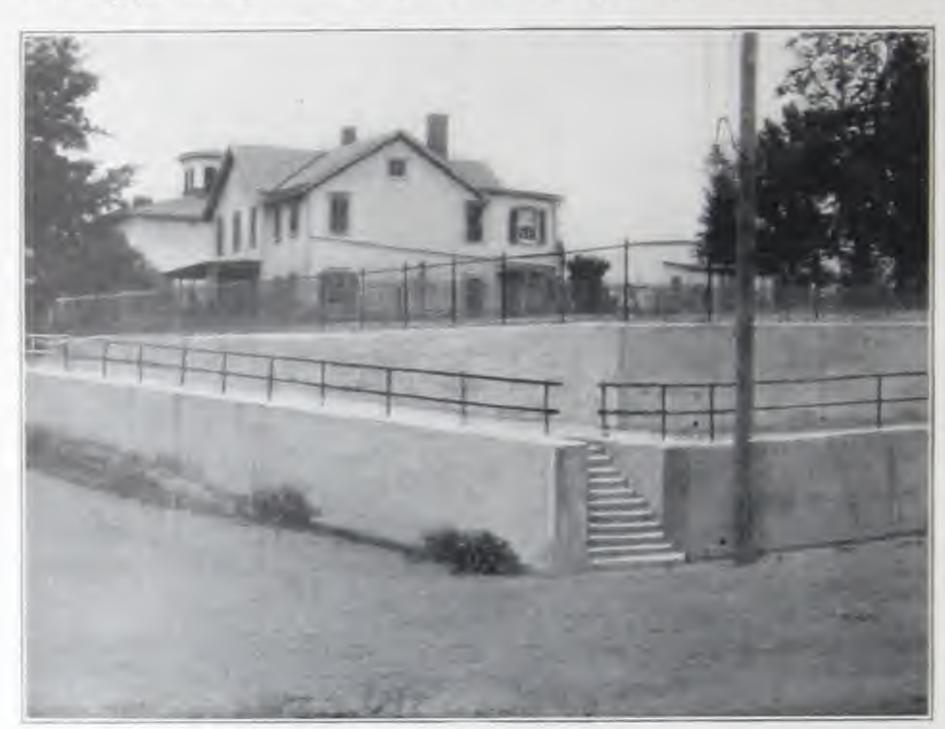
SERIES OF WALLS TO RETAIN AN EMBANKMENT.
